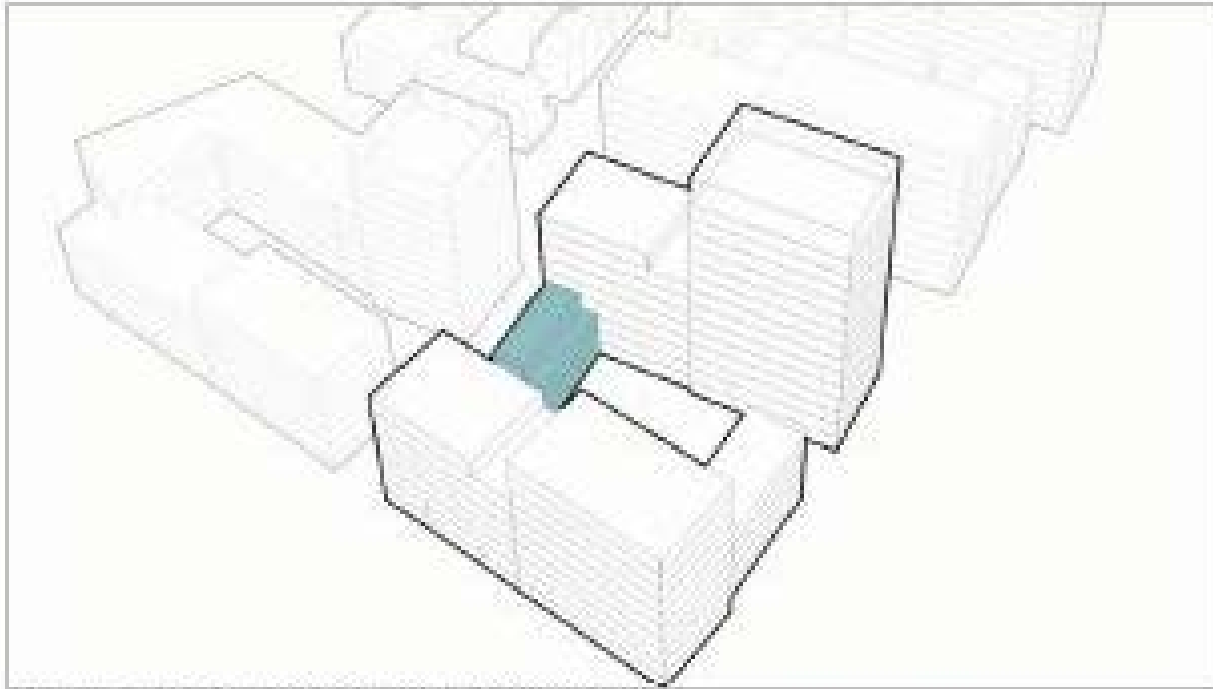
Proposed design - aerial view of 120 showing additional 2 low-rise blocks
